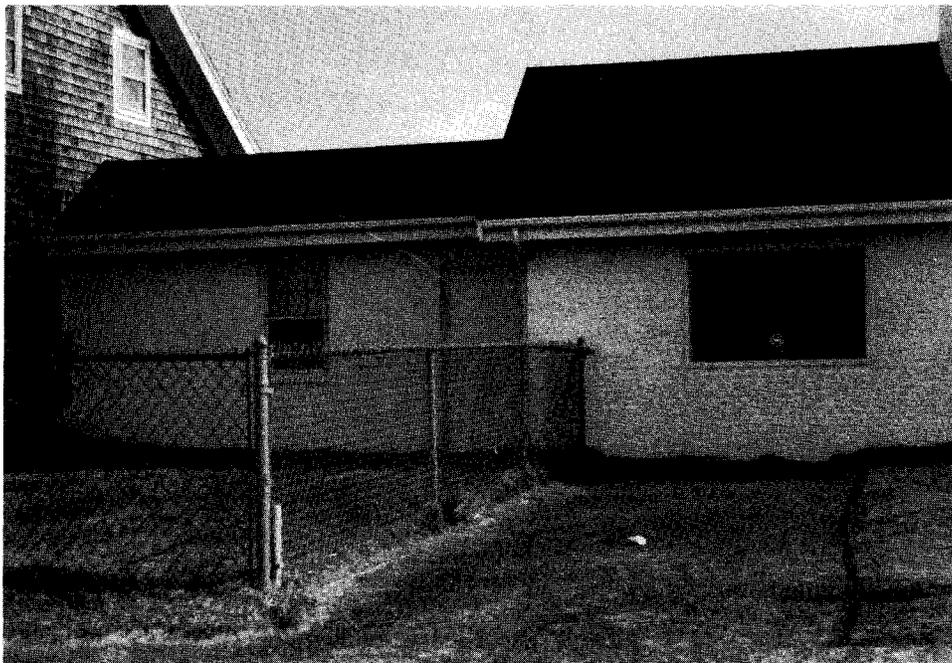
Connector at the Keeper's Dwelling and Tower Connector, west elevation.
